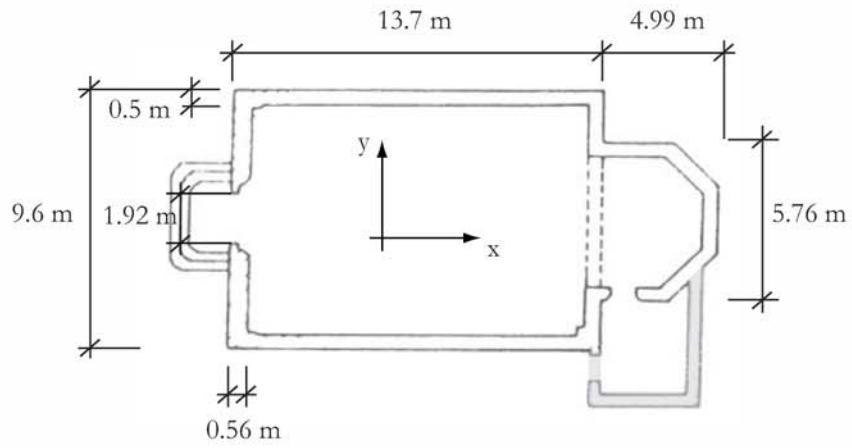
Plan of Santa Maria del Fossale, with dimensions (the plan is taken from [Do 94]).
